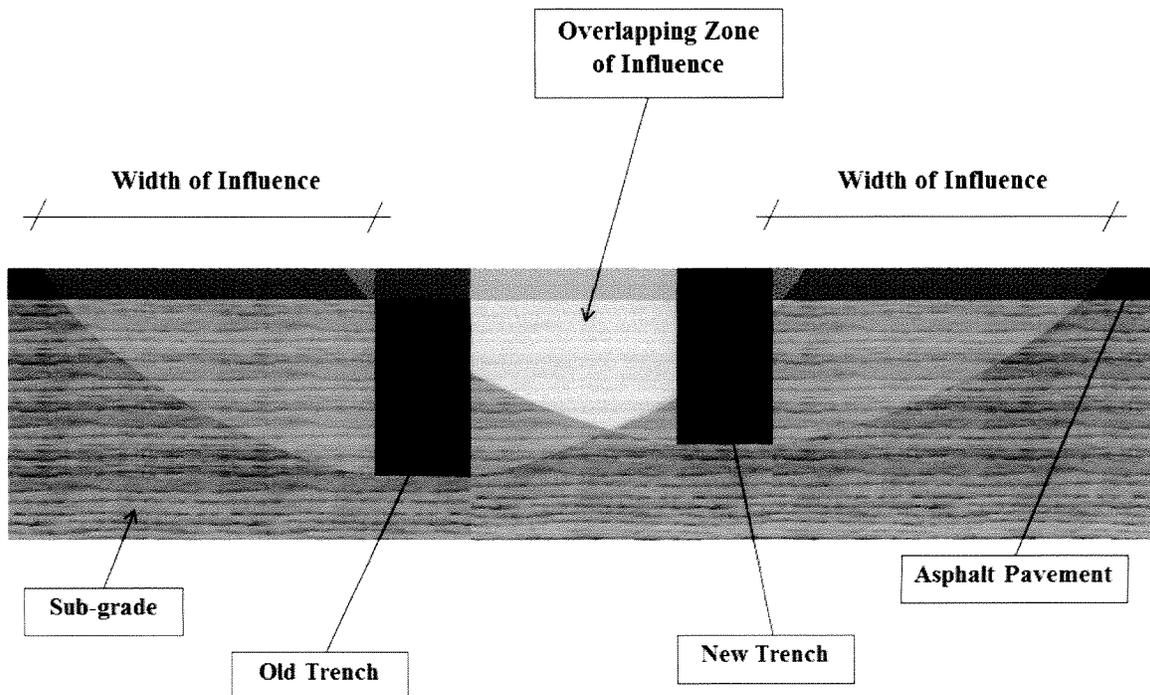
Sketch of Overlapping Width of Influence under pavement.
